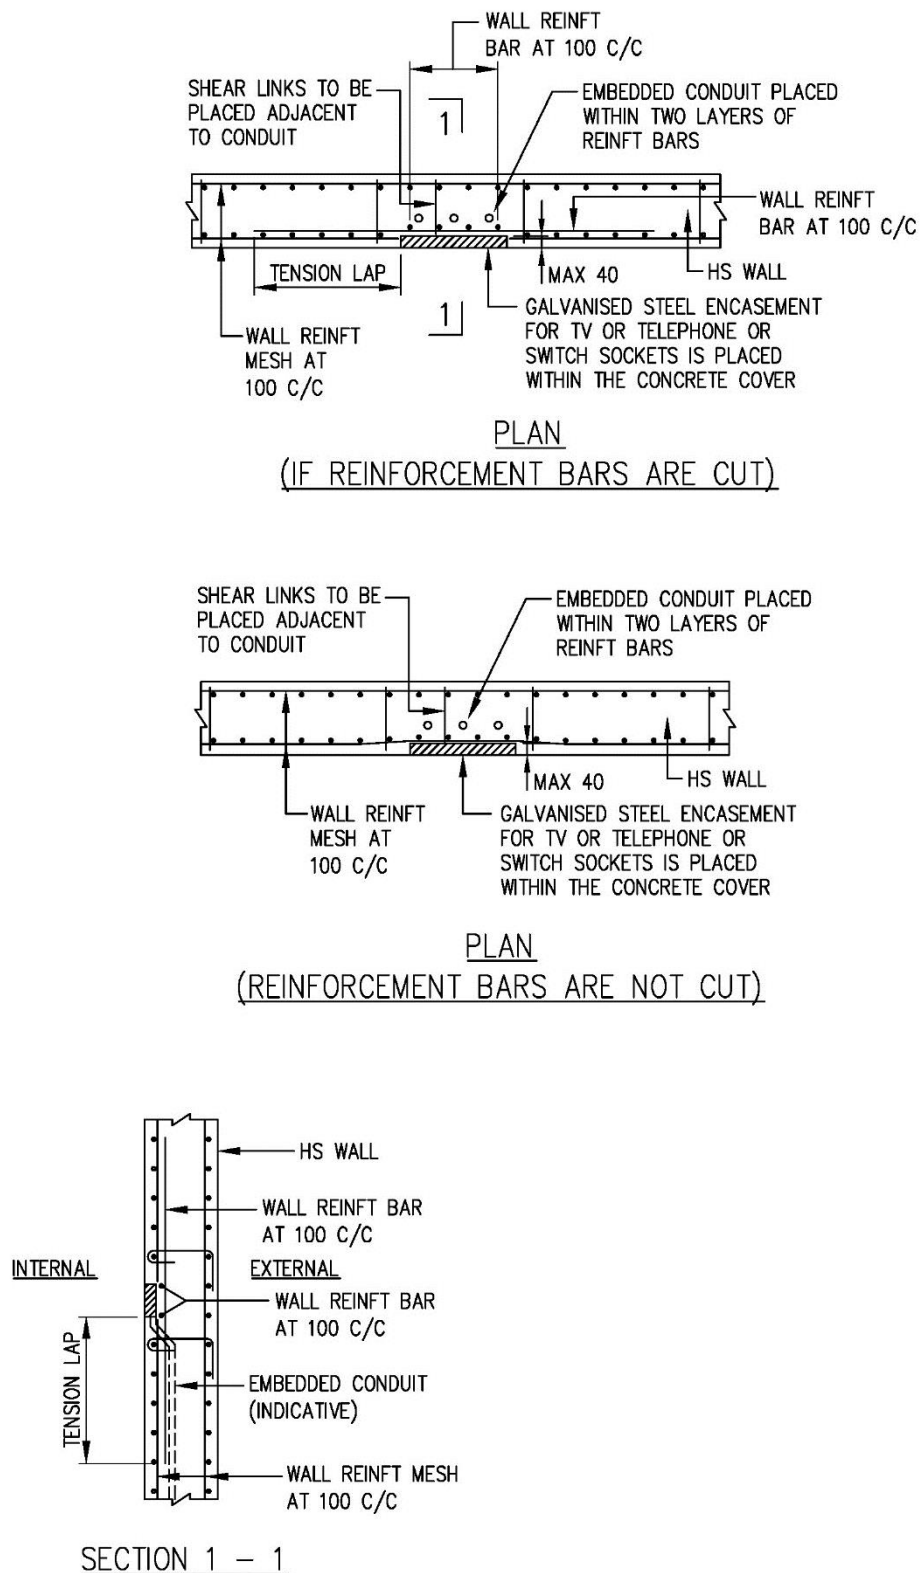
STEEL REINFORCEMENT BAR DETAILS FOR SWITCHED OUTLET, TC, RADIO AND POWER POINT
